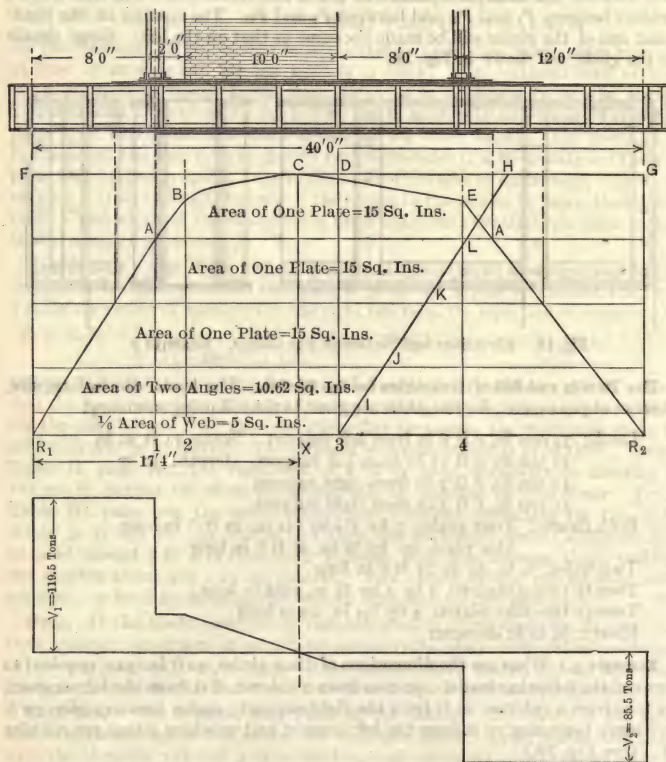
Elevation of Box Girder and Diagrams for Bending Moments and Vertical Shears. Example 3
